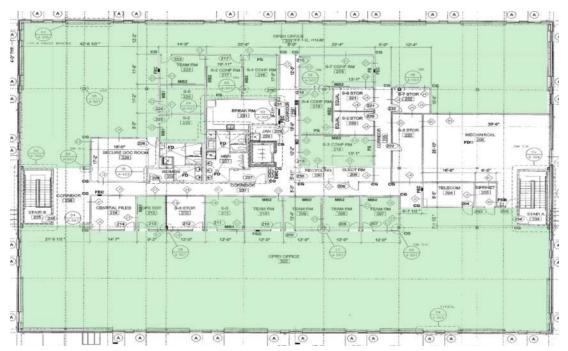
BDEHQ second floor plan showing regularly occupied spaces.
